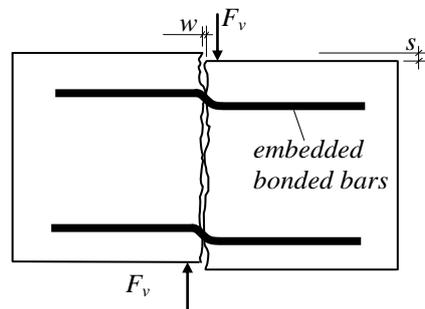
The connection is tied together by embedded transverse reinforcement anchored by bond. The figure is based on fib (2008).
